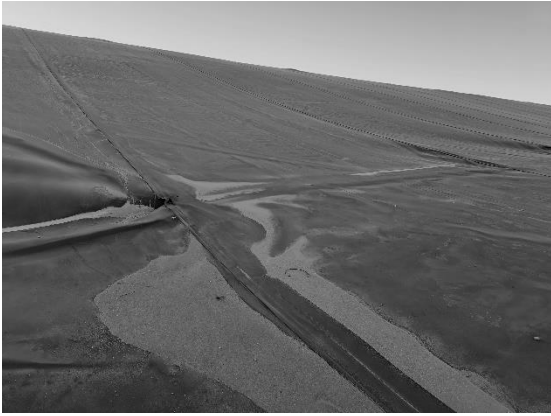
A burn out due to welding a straight liner to a wrinkled liner.
